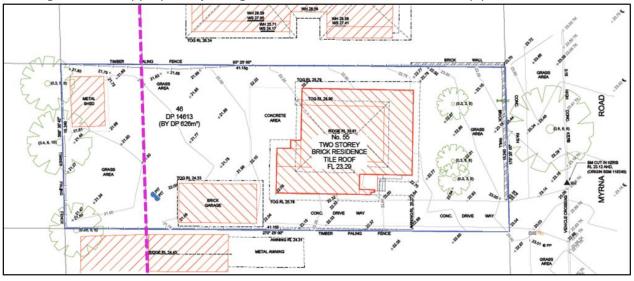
Survey with sewerage line traversing the rear of the site (highlighted in purple).
